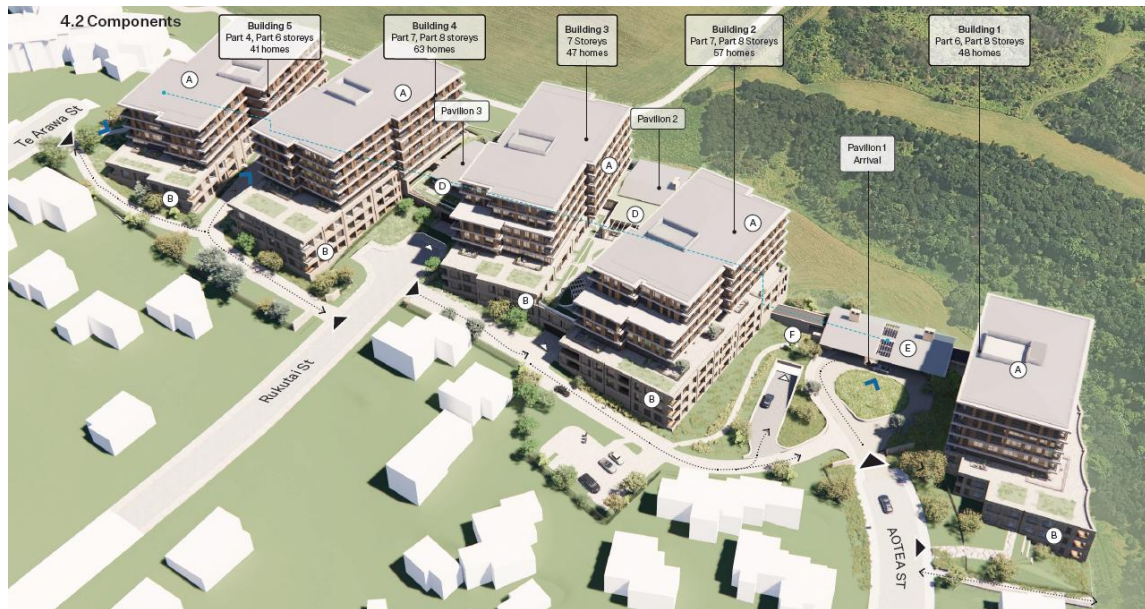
Architect's aerial perspective showing the overall Proposal viewed from the south (refer Sheet 11 of the WAM Architectural Design Statement).
